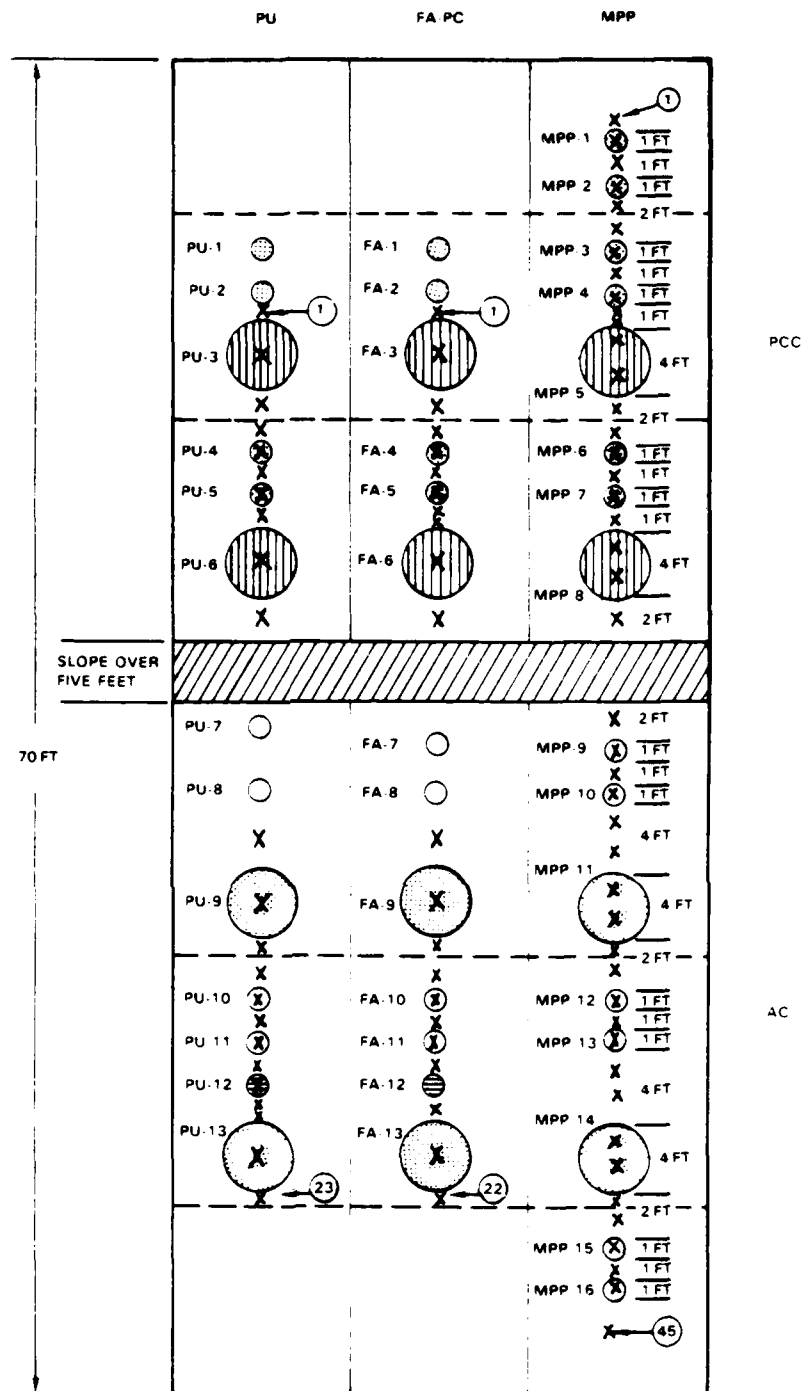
Plan View of Test Bed, Spall Repair with Advanced Materials.
